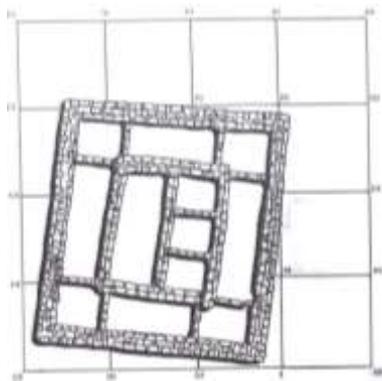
Site plan for rectangular shaped structures outside the northern city wall
